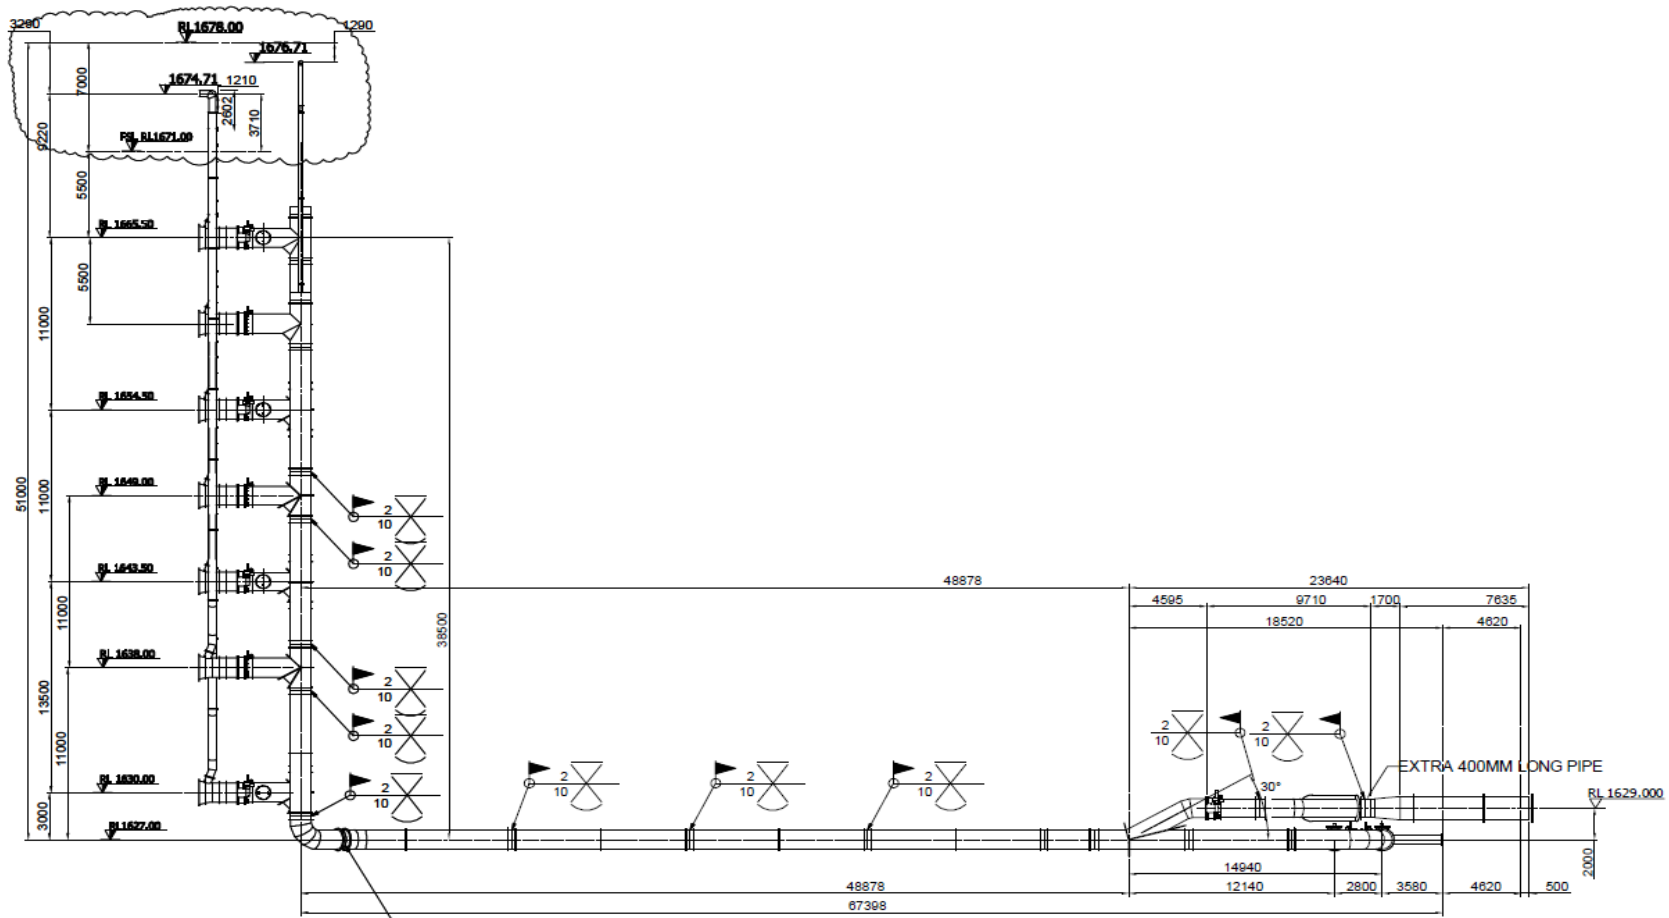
Side view of Metolong Dam intake pipes, facing South-East (Source: Metolong dam safety department).
